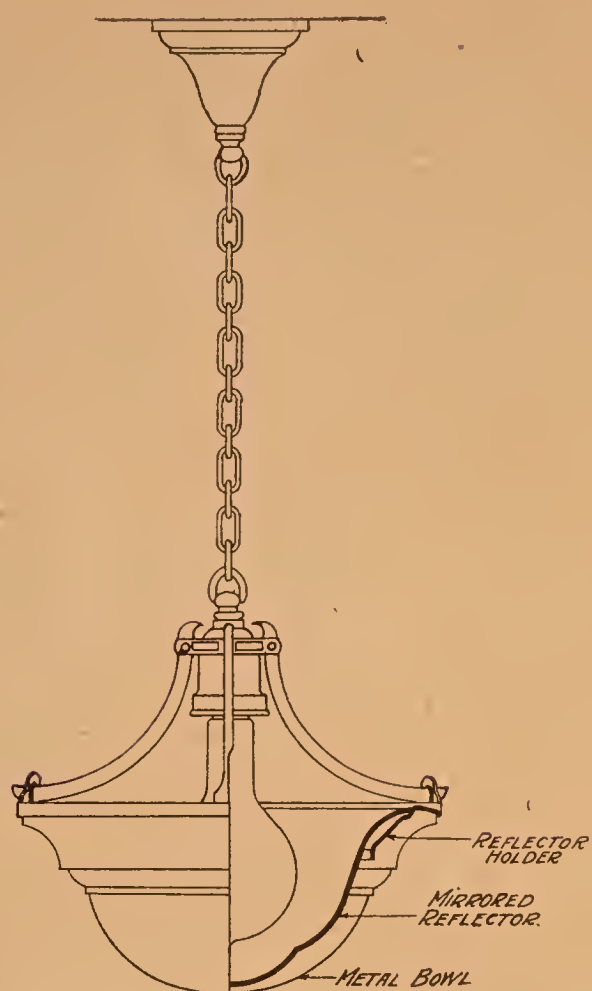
Indirect fixture provided with auxiliary mirrored glass reflector.
